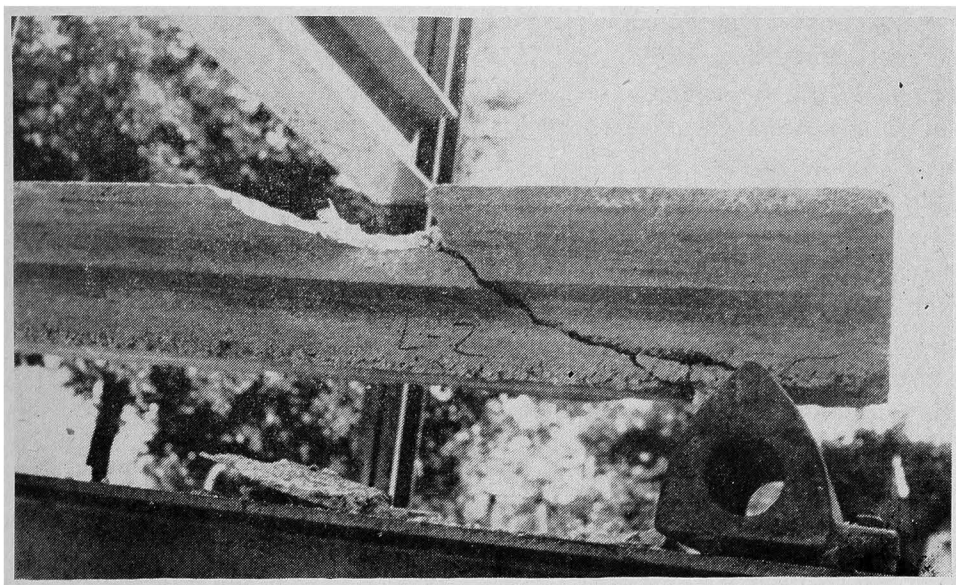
(a). Typical failures of concrete beams. Note failing plane very similar to those of the tile beams. All concrete beams failed in similar manner.
